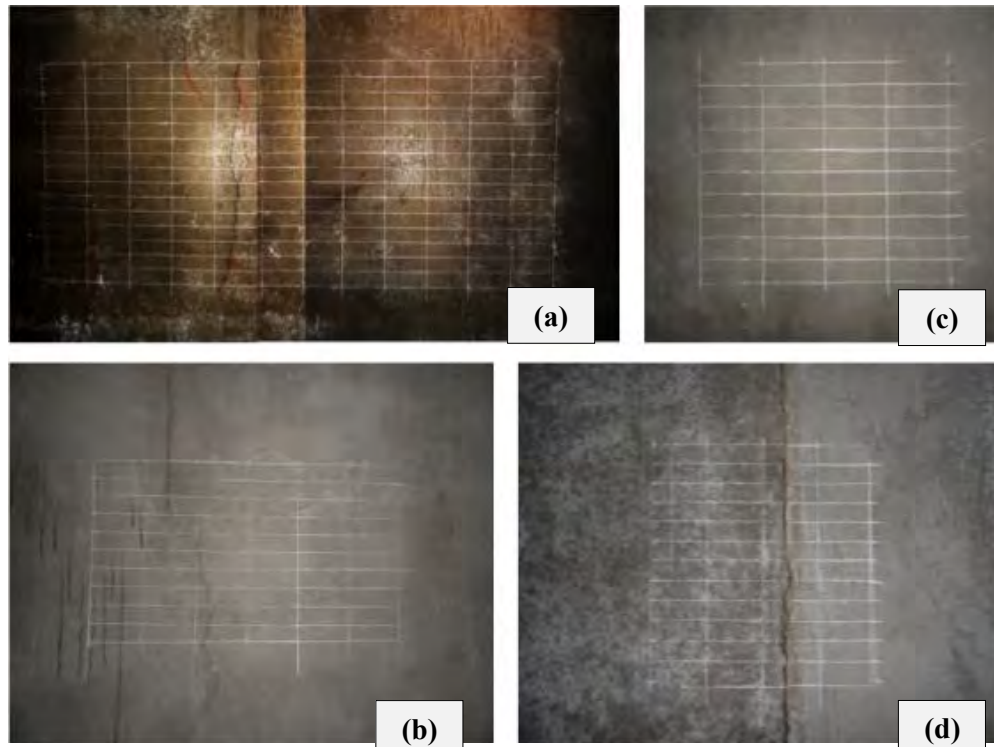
Images of areas tested at Hanging Lake Tunnel: (a-b) severe vertical cracks, (c) sound concrete, and (d) lining joint.
